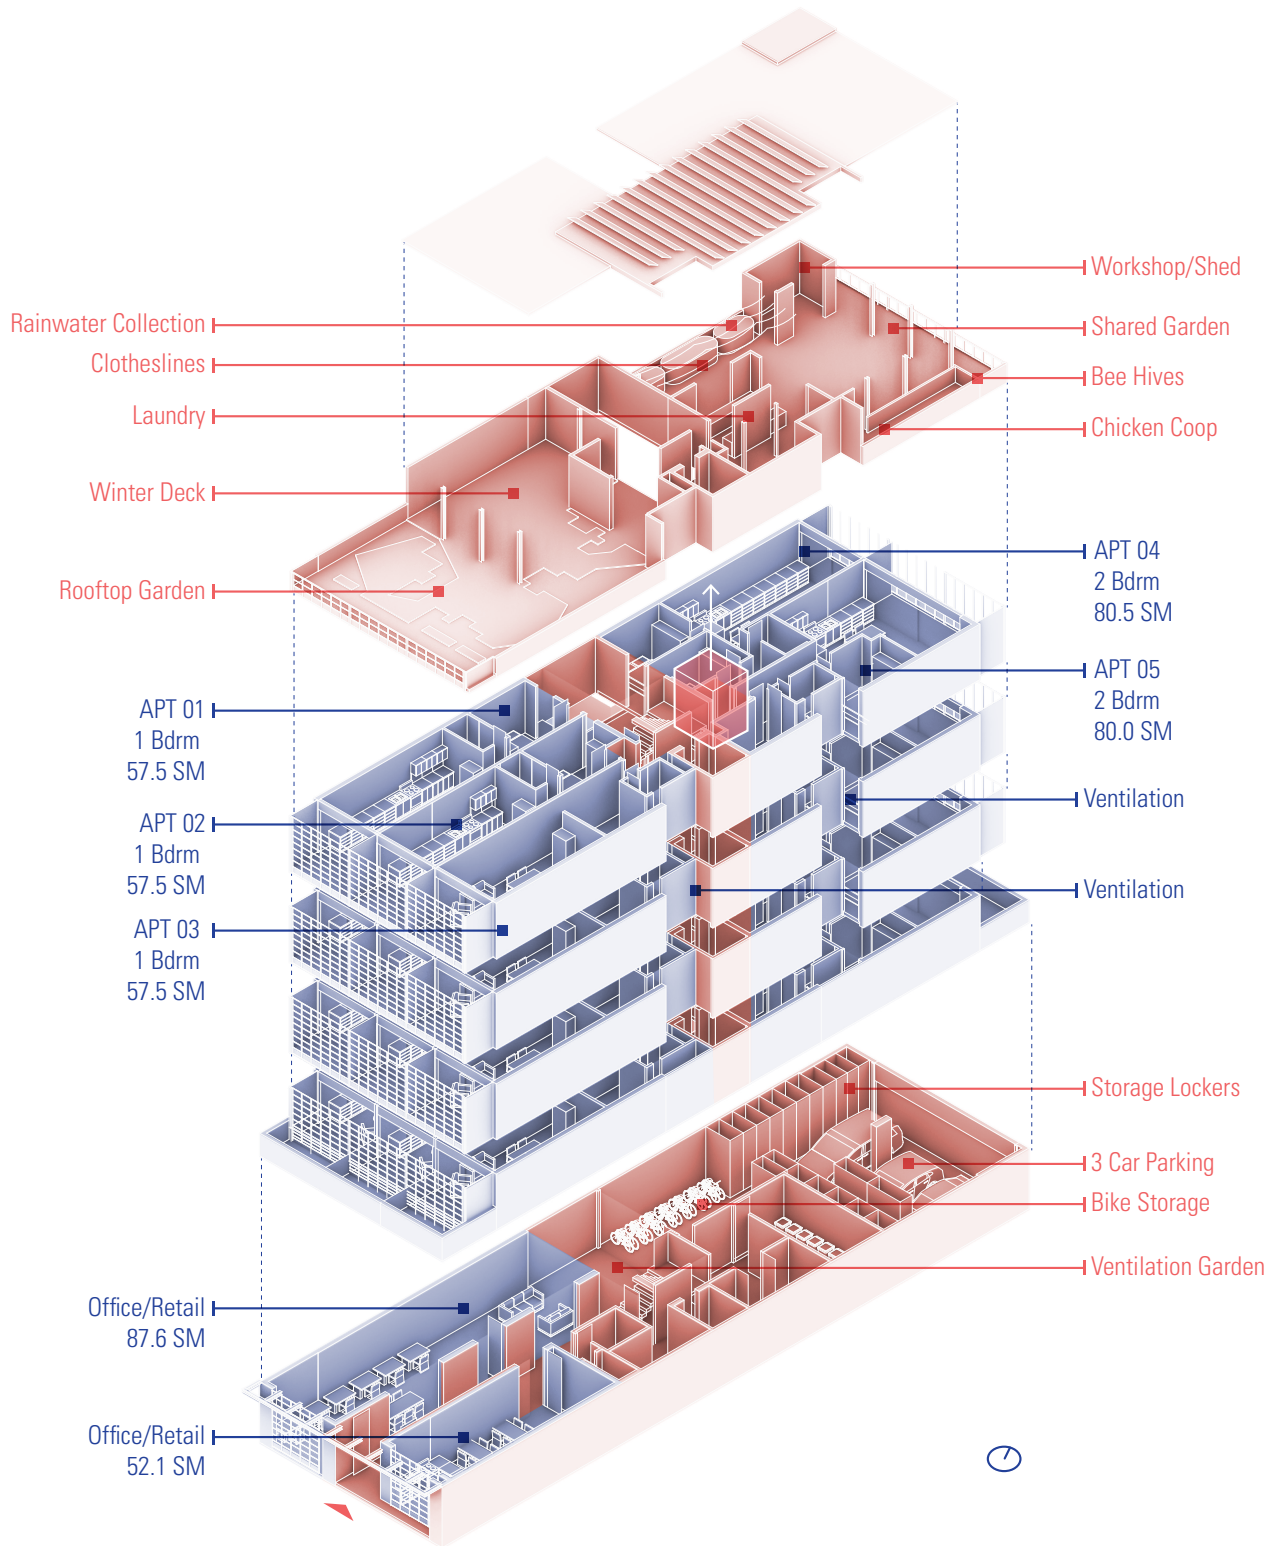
| Nightingale 1 Exploded Axonometric
